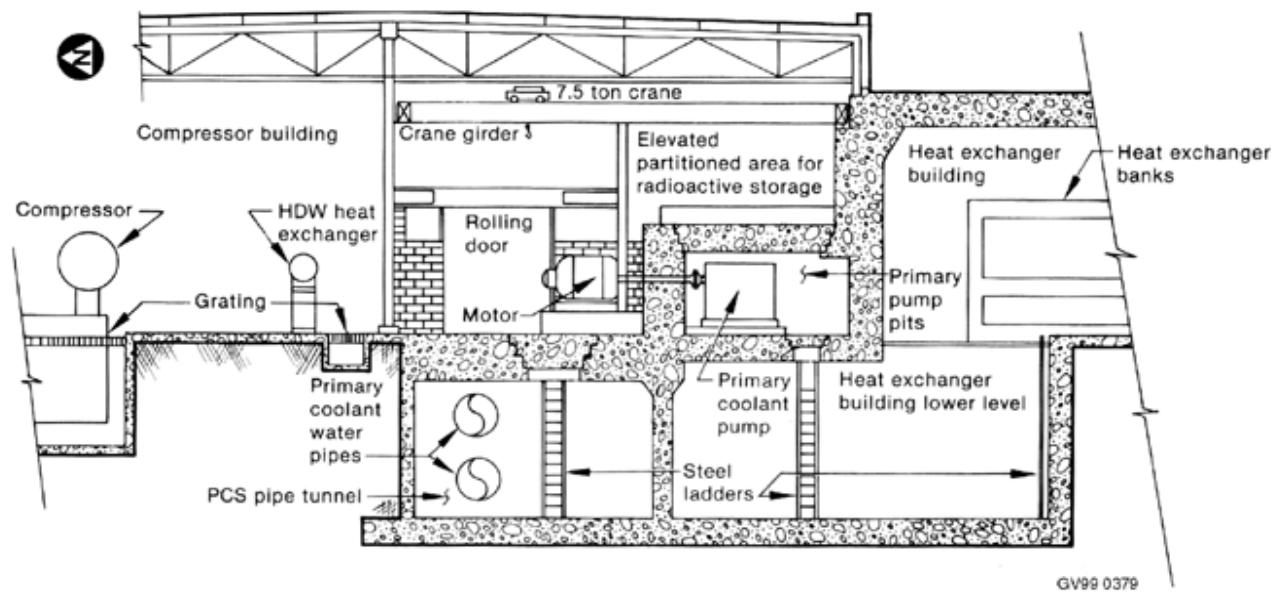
Elevation cutaway drawing of the ETR compressor building (TRA-643).
